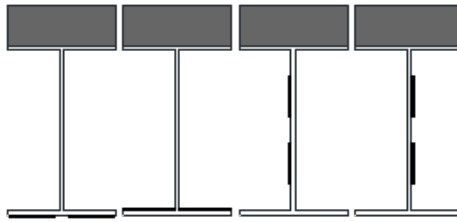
Location of CFRP Laminate on Cross Section of the Steel.
